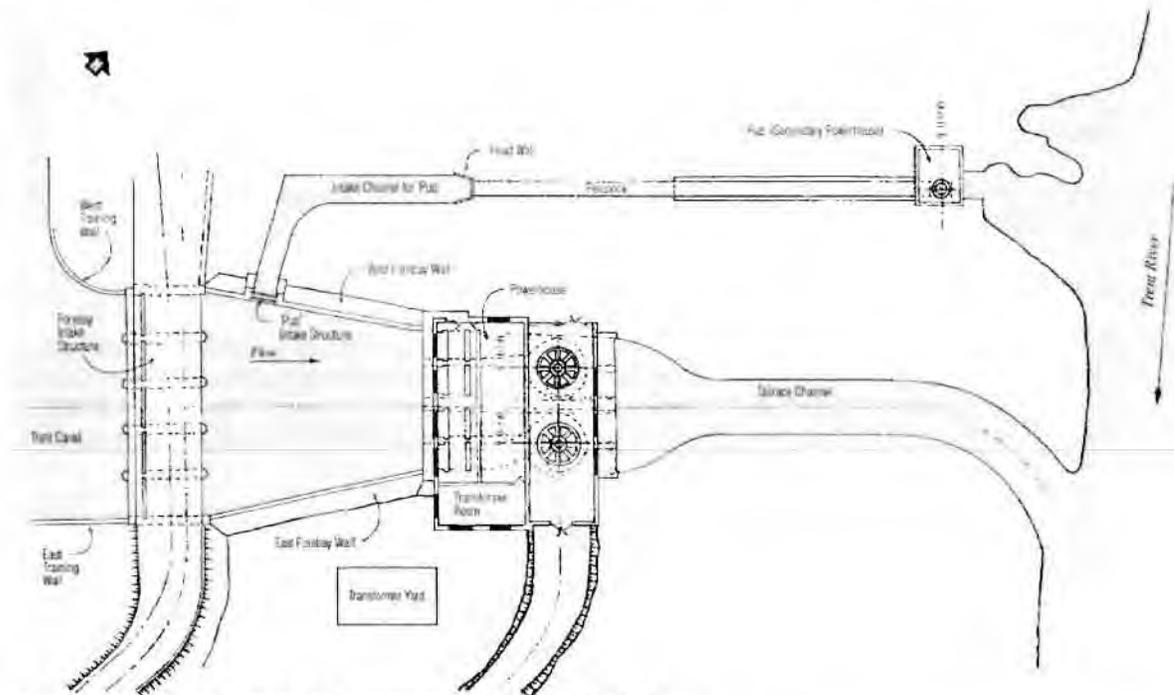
Existing Ranney Falls Generating Station - Plan View
